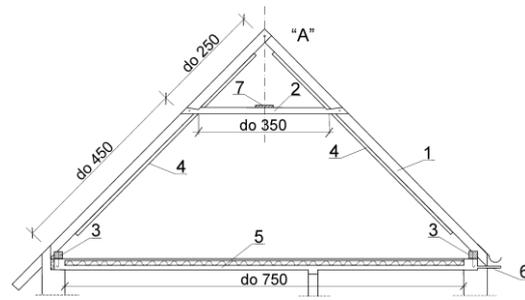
Collar-beam roof with not supported collar rafters: 1 - rafter, 2 - collar rafter, 3 - plate, 4 - wind brace, 5 - reinforced concrete floor, 6 - cornice, 7 - board brace
